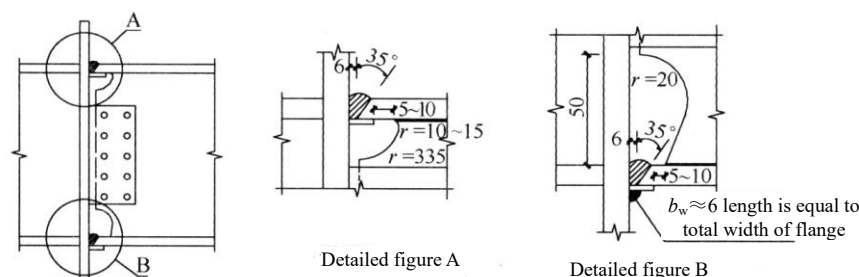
On-site Connection of Frame Beam and Column
